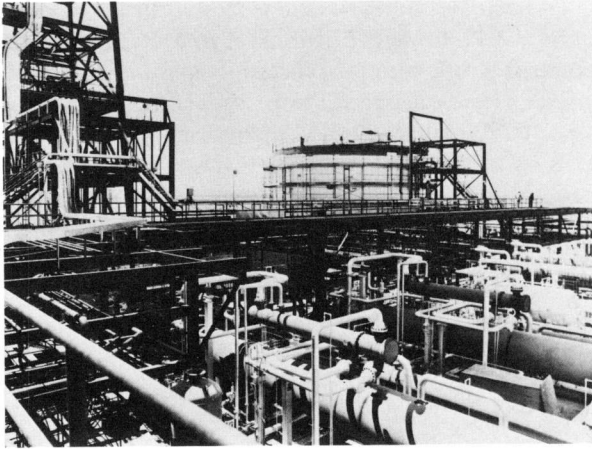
10-MWe Plant Core Area Under Construction, July 1981
